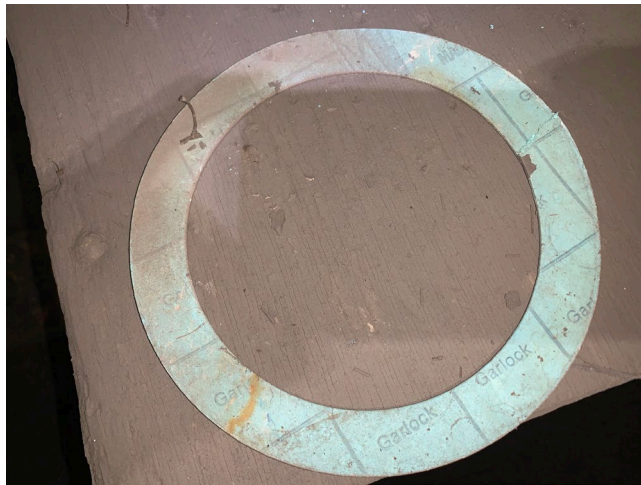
Asbestos-containing 8" gasket in basement pool pump room
